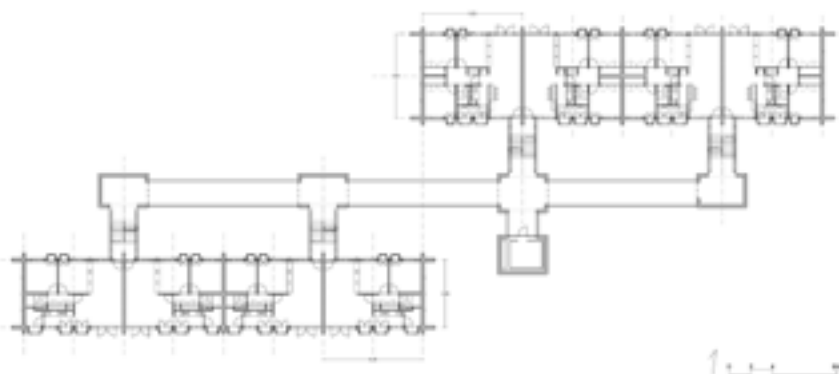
Antonio Quintana and Alberto Rodríguez. *Apartment building at Malecón and F (Girón Building)*. Havana, Cuba, 1967. Typical floorplan. Produced by the authors based on measurements on site. © Óscar Pedrós Fernández, Sara Rodríguez Cajaraville.
